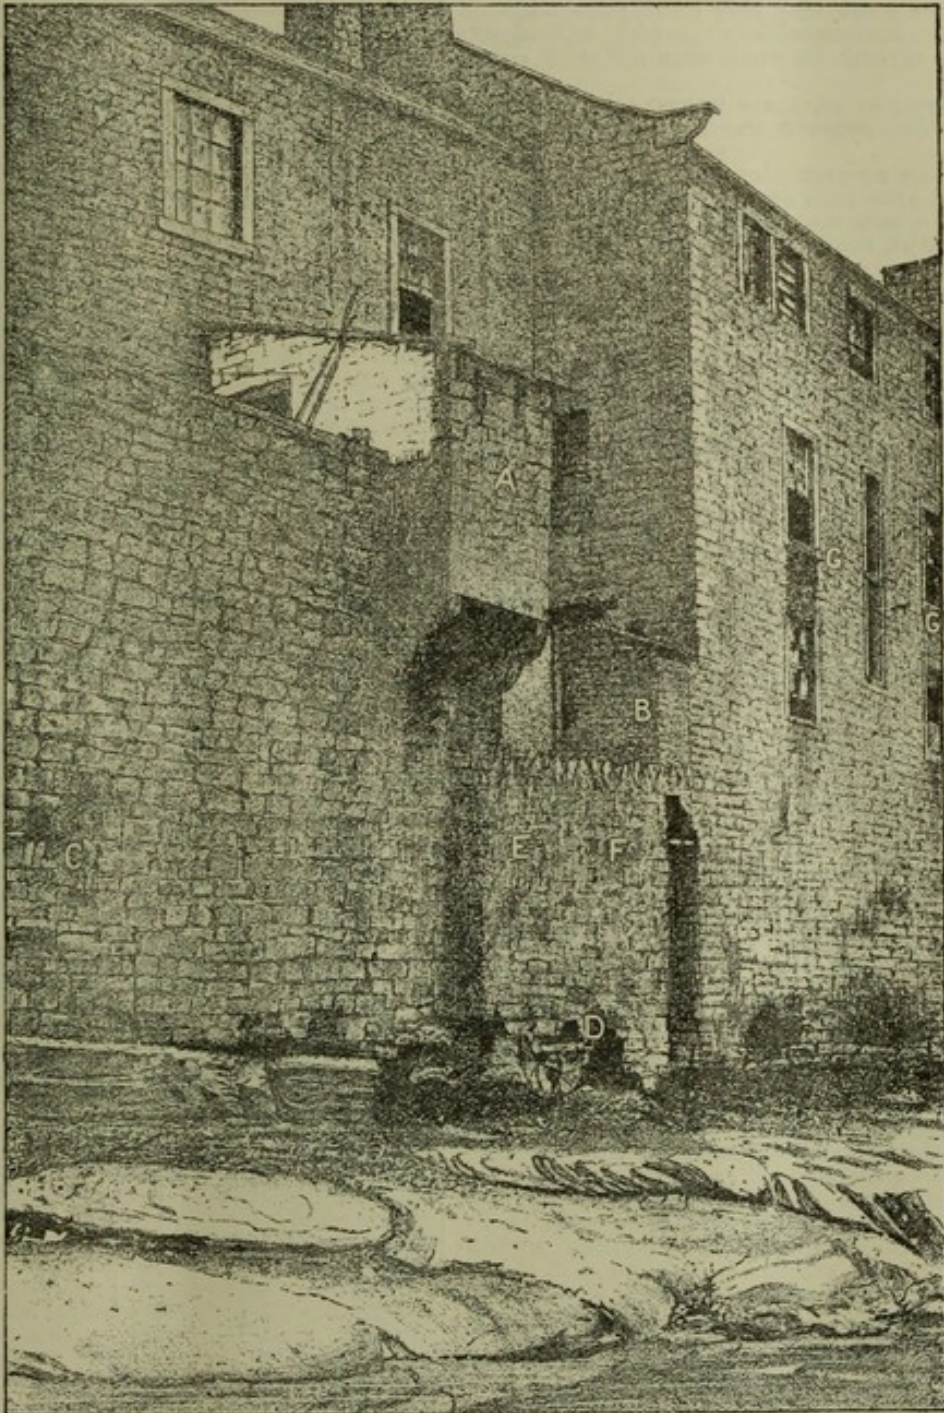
View showing back of houses abutting on foreshore of river Tees north of Barnard Castle Bridge, Bridge End, Startforth. A, privy serving four houses; B, privy serving one house; C, D, E, F, yard and foundation drains; G, windows through which excrement and ashes are discharged from houses unprovided with drains, privies, or ashpits.
